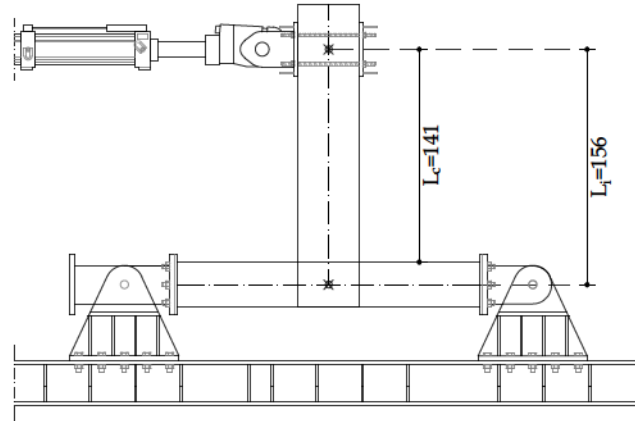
Test layout of conventional specimens (units:cm).
